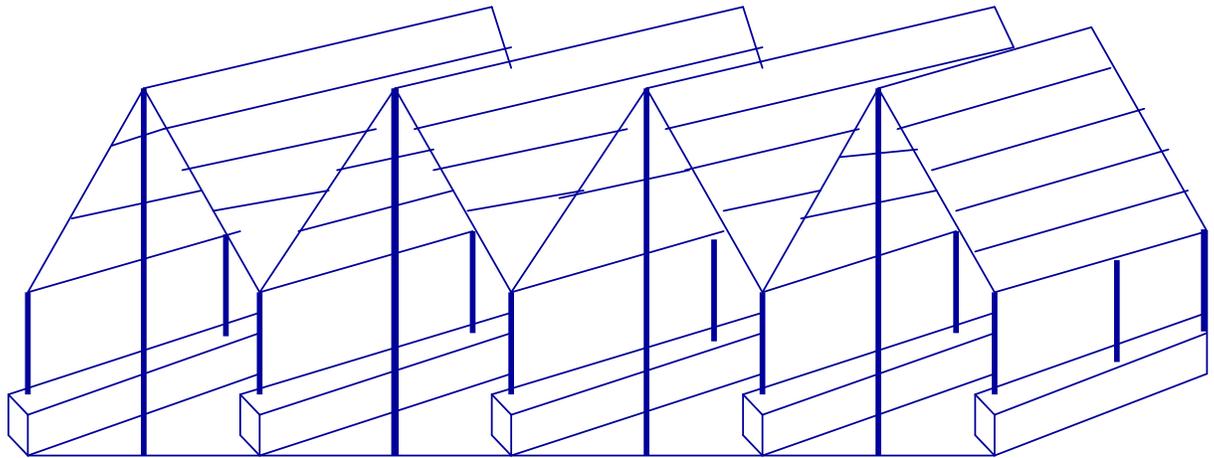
Drying sheds used in Kolar/ Malur brick kiln units
